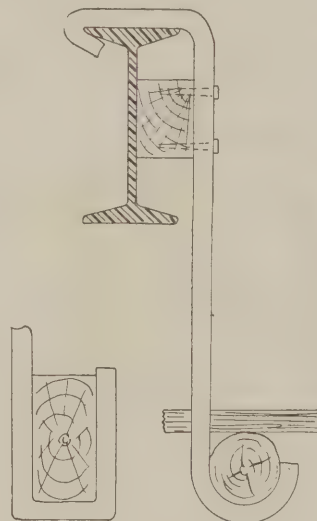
Method Used When the Platform Is Laid at Right Angles to the Girder.
